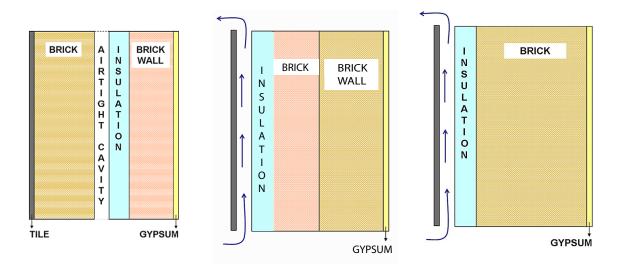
Scheme of the conventional building envelope (left) and of the ventilated building envelope (right).
